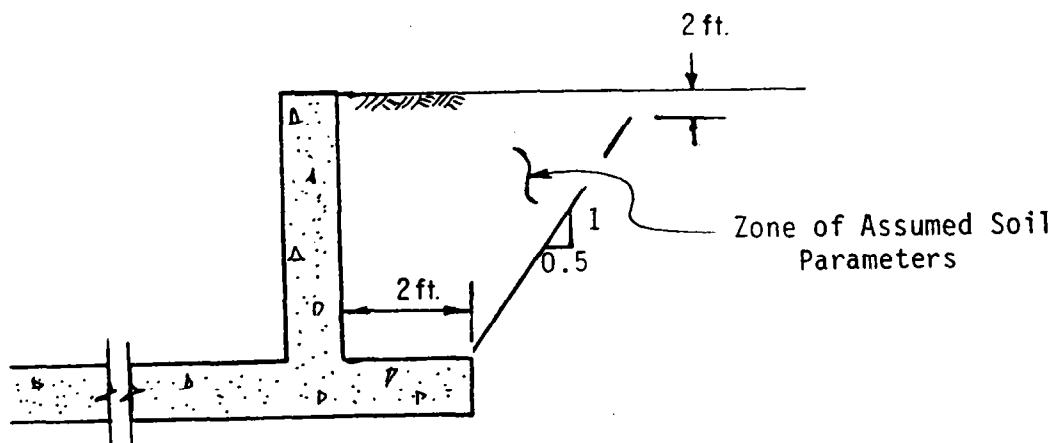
BACKFILL ZONE OF PROBABLE FAILURE FROM DEFLECTION
